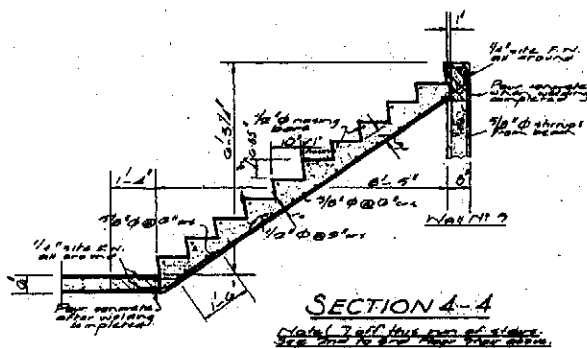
The stairs in the service core showing reinforcement on the left and the distribution of out of plane flexural forces that the stairs are subjected to in a north/south direction Maximum Credible Earthquake (MCE) scenario after which the stairs are to remain usable.
